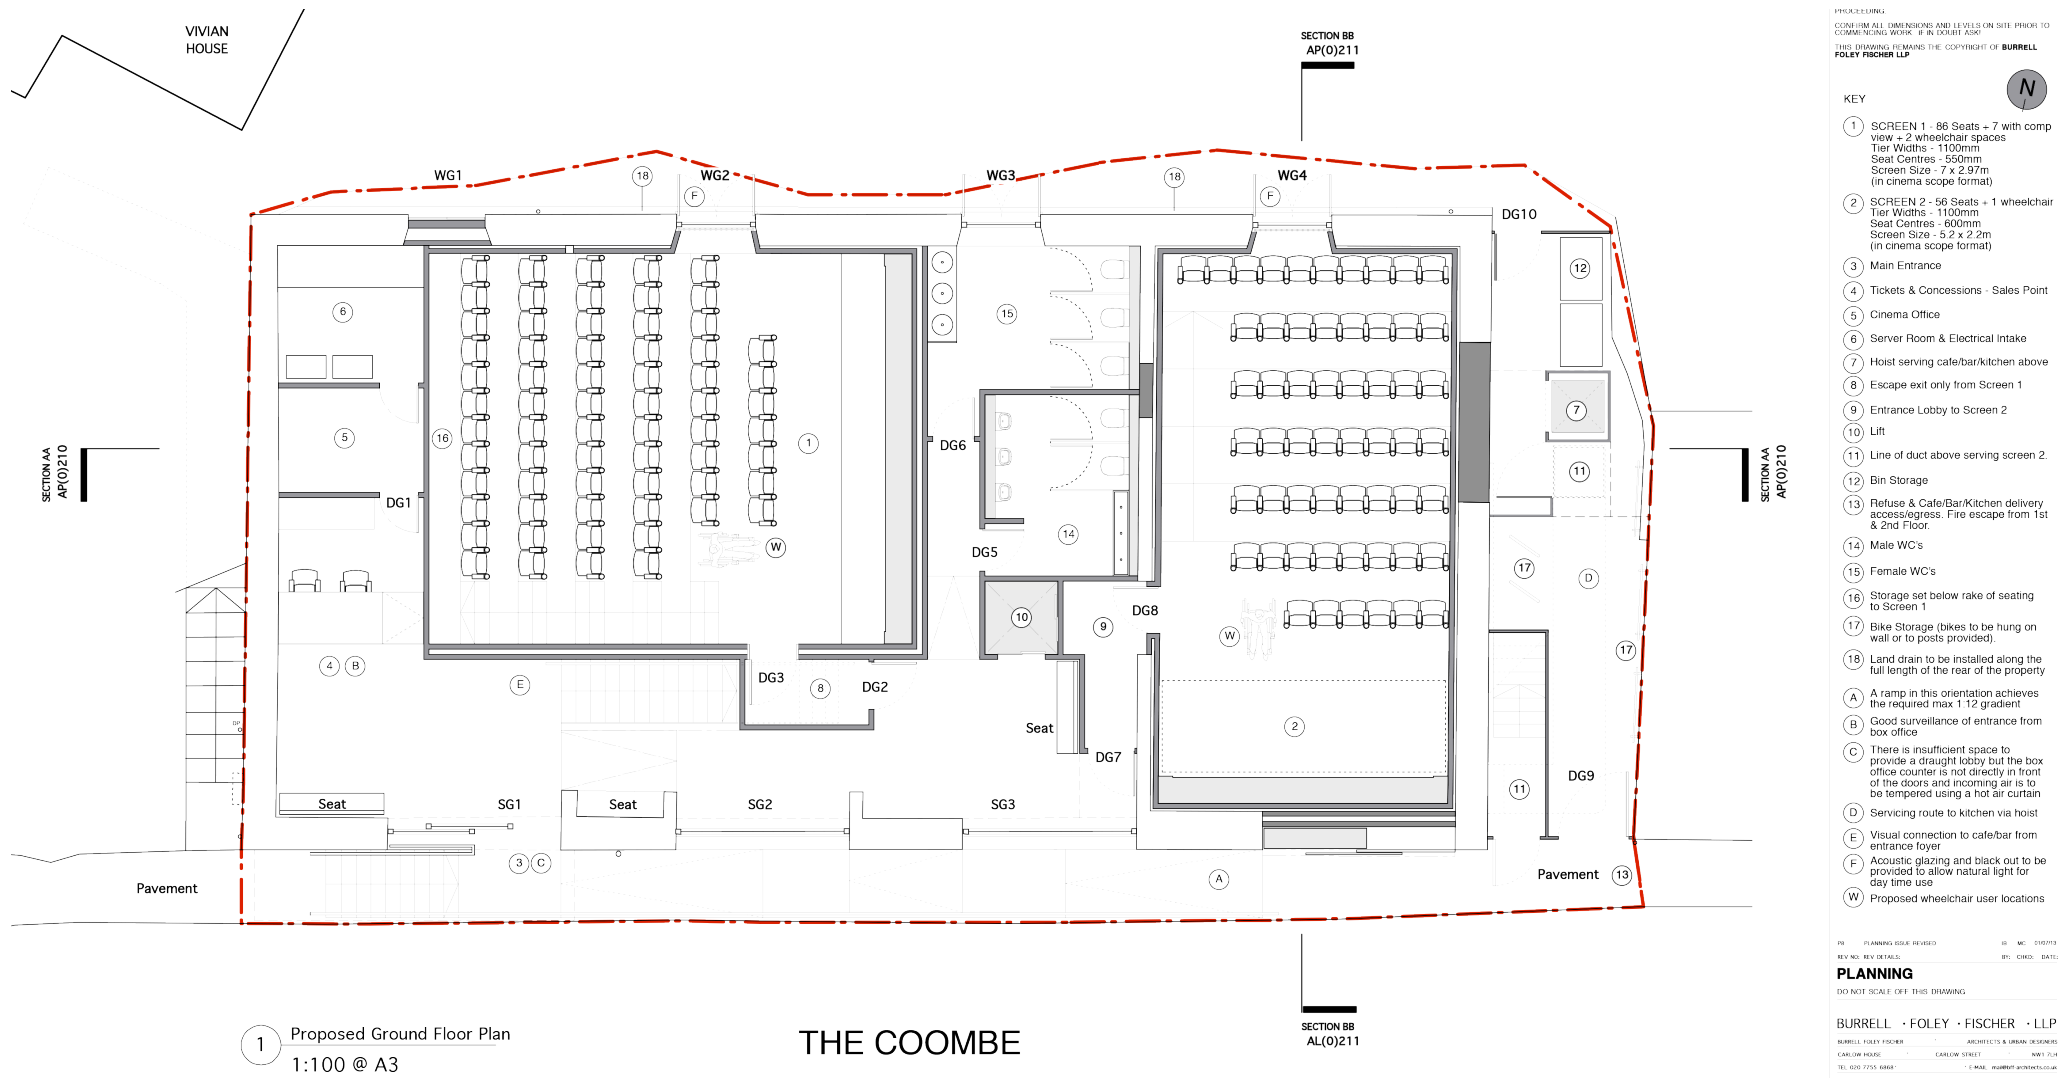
Ground floor plan. Newlyn Film House. 2013.
